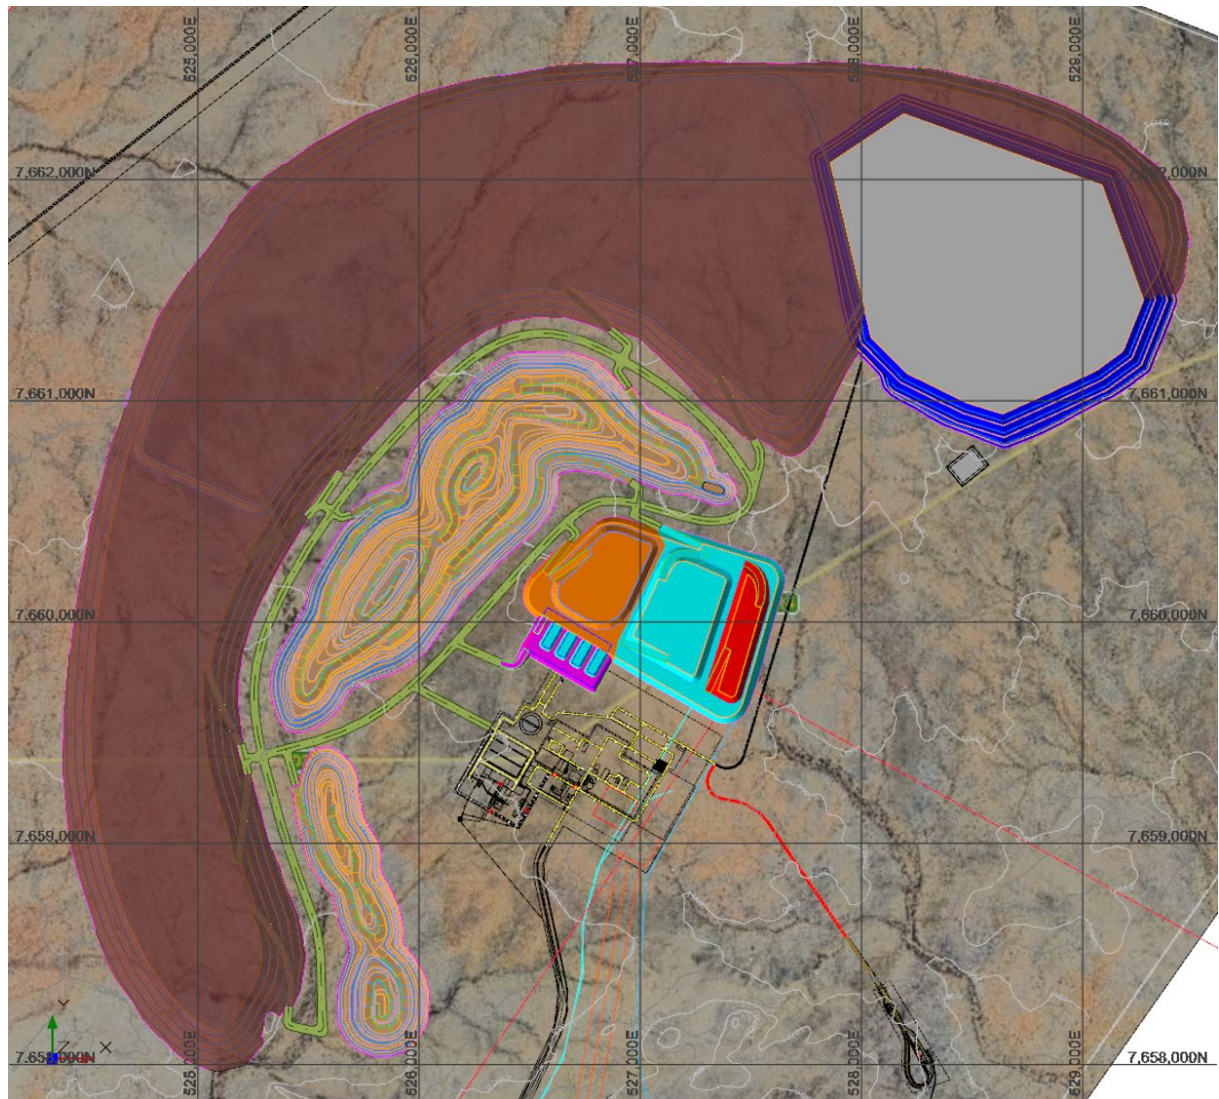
General Mine Layout Showing Pits, WRD, ROM Pad and TSF
